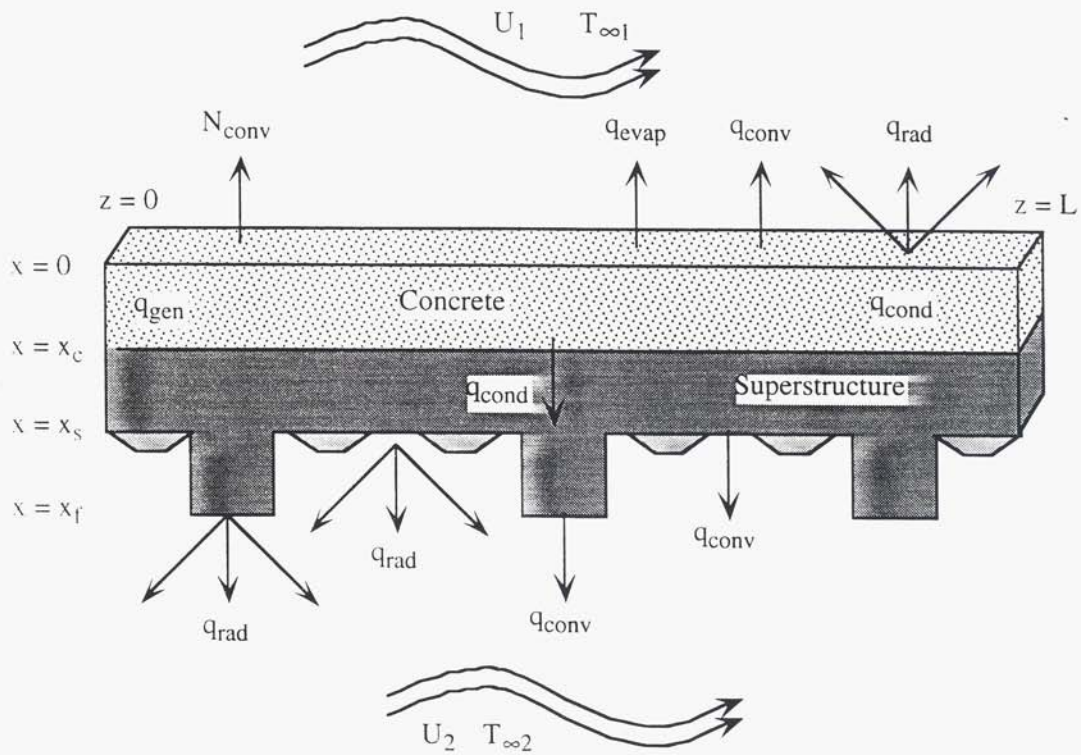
Standard, single-span, bridge deck with associated heat and mass transfer mechanisms.
